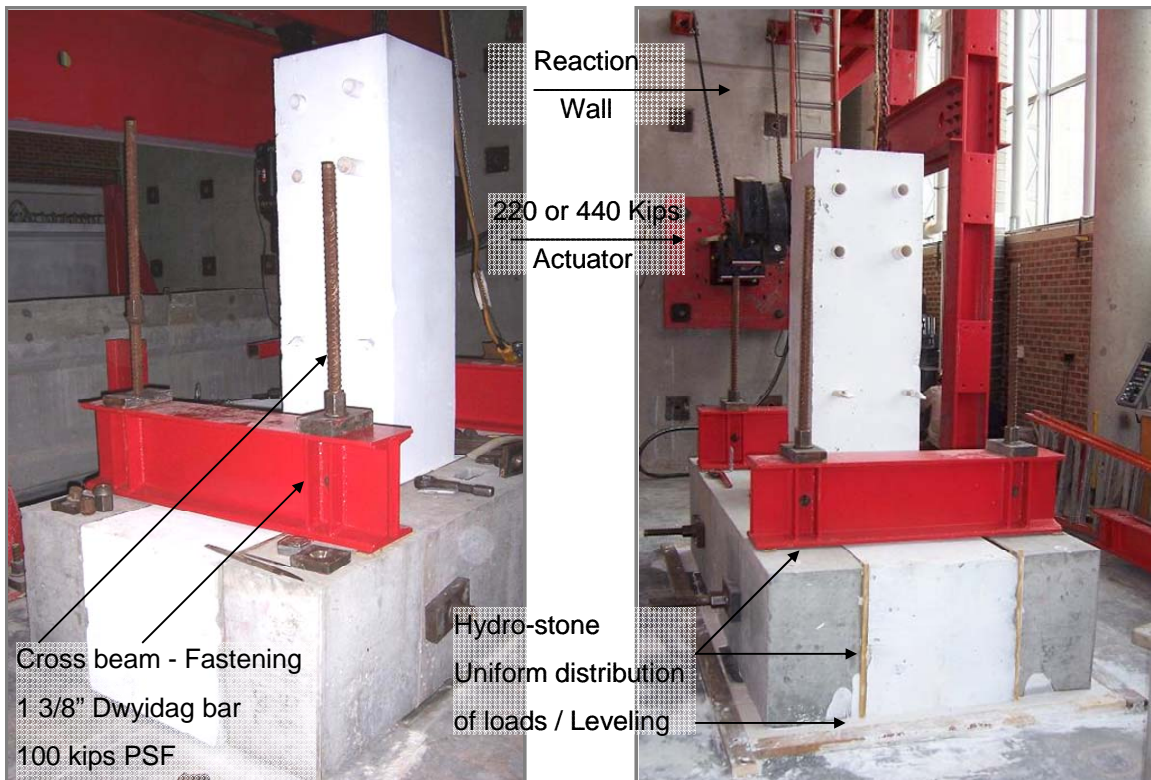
Test Setup Support Details (Left), Footing Side Beams (Right)
